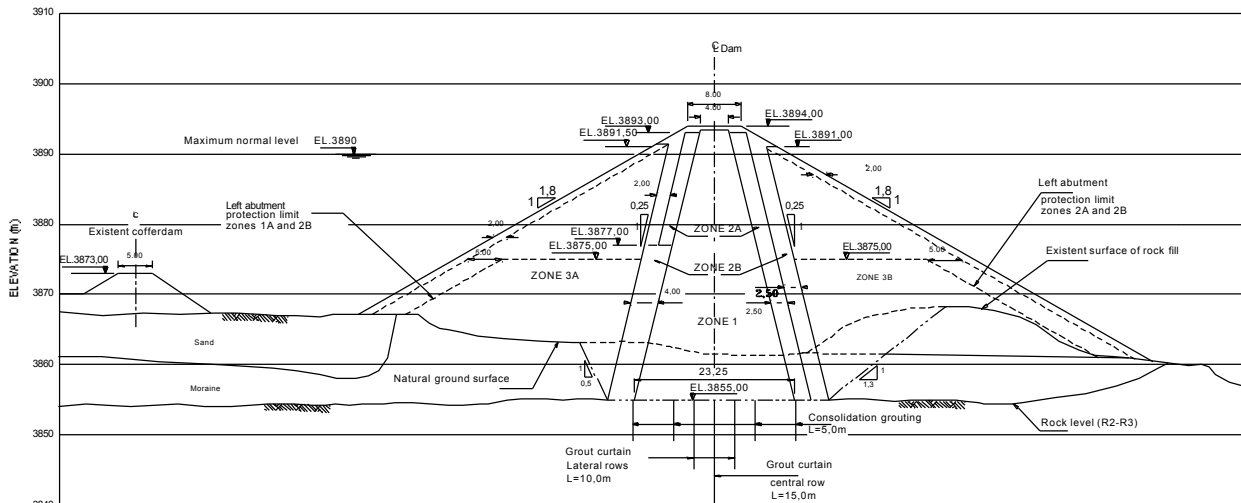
Salva Faccha dam: Foundation treatment: grouting and filters
